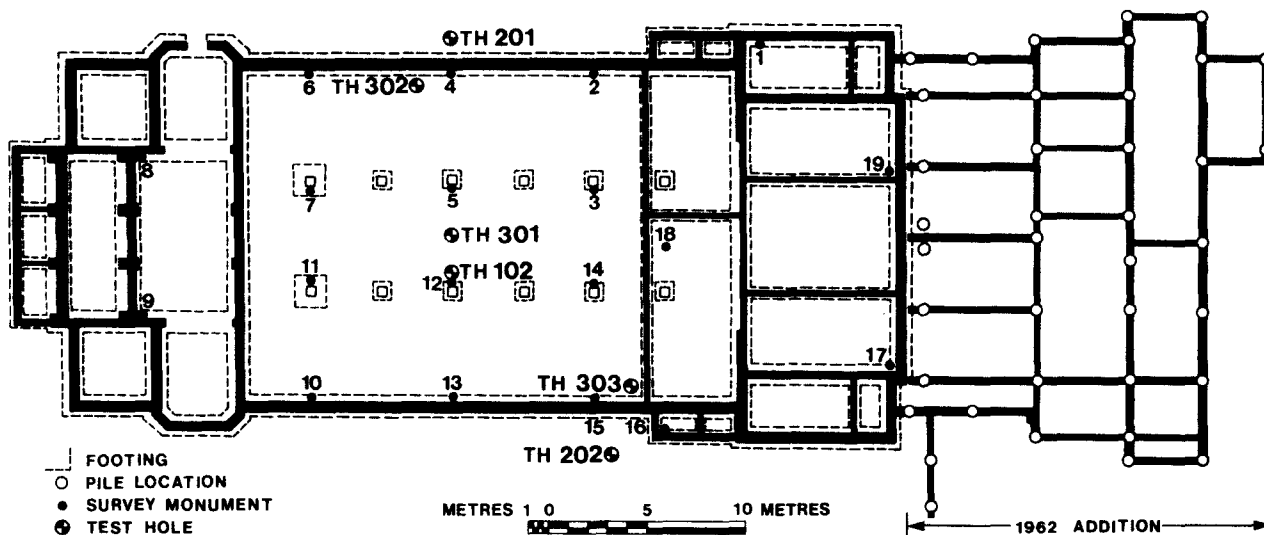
Foundation Plan Showing Locations of Test Holes and Survey Monuments
